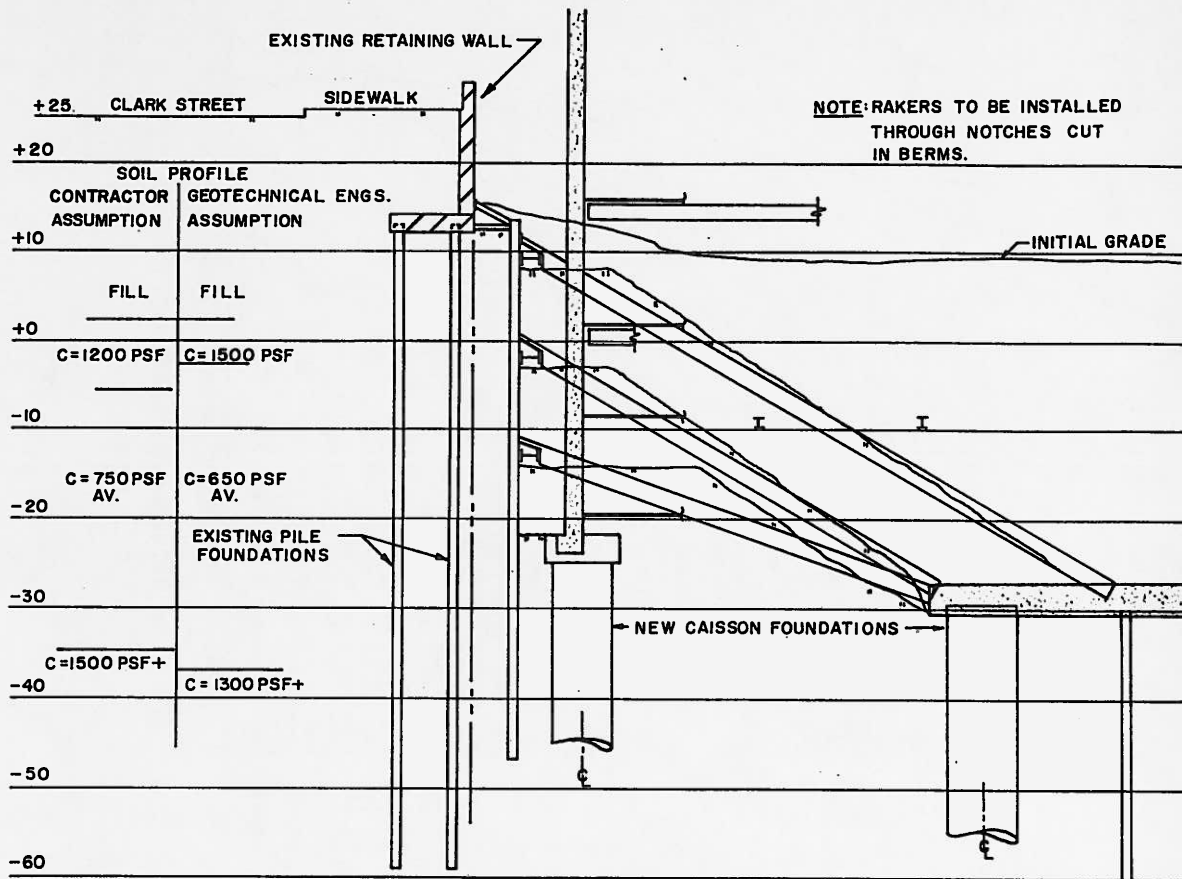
EXISTING & PLANNED CONSTRUCTION
